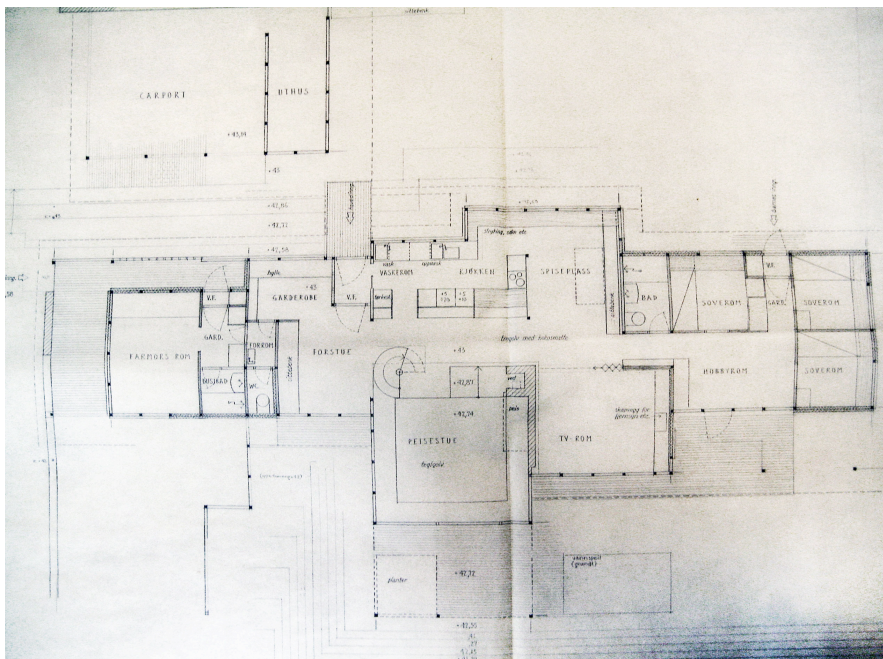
Are Vesterlid. *Ground plan, first floor, from the Nordic Villaparade.* (08.01.1963)
